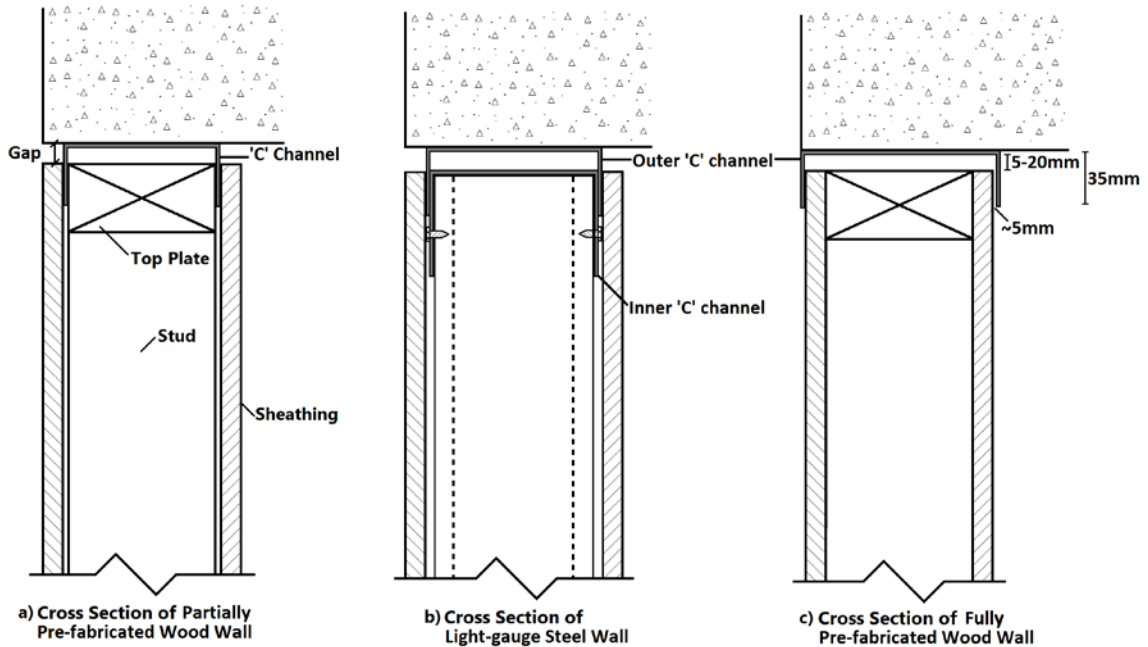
Cross Sections of Top Connections: (a) Partially Prefabricated Wood Wall; (b) Light-gauge Steel Wall; (c) Fully Prefabricated Wood Wall.
